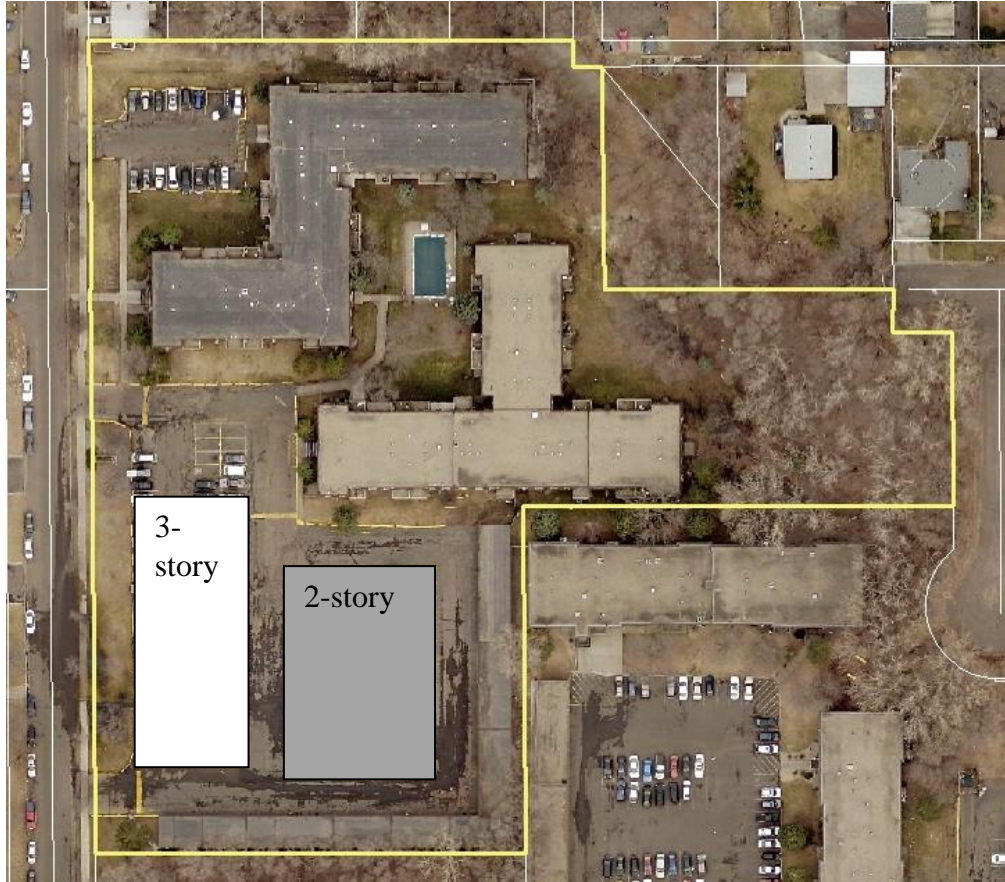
Potential New 3-Story Residential Building at 478 Hazel Street North Under RM2 Standards
